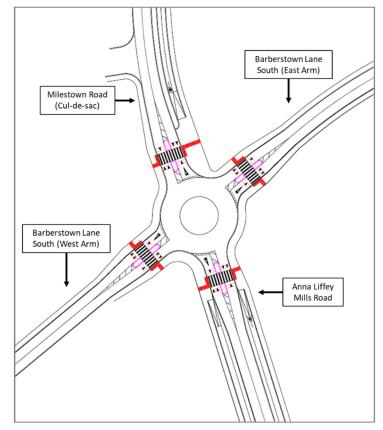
Proposed Milestown Road/Anna Liffey Mills Road/Woodwall Road Junction Layout (Junction 5)
